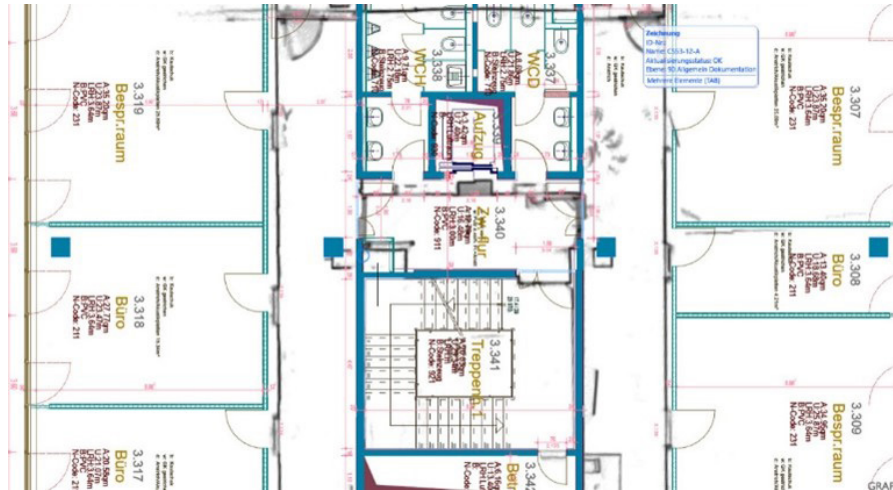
2D Laser Scanning Plan (Black) Compared to Provided Building Plan (blue) (own illustration)
